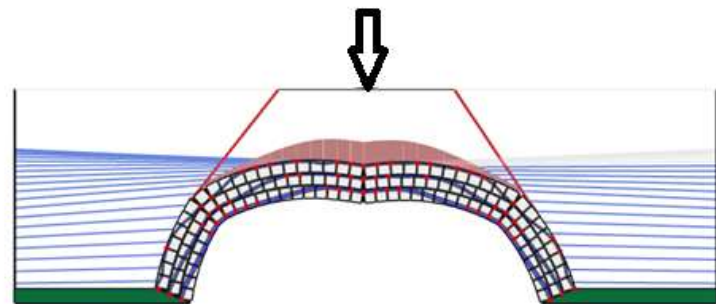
Collapse mechanism for arch loaded by 1.5 m square footing, column position at arch mid-span
